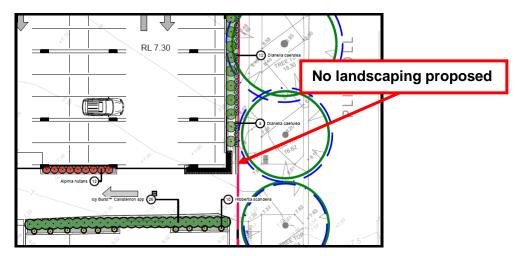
Landscape Plan (Source: Site Design Studio, Revision D)
